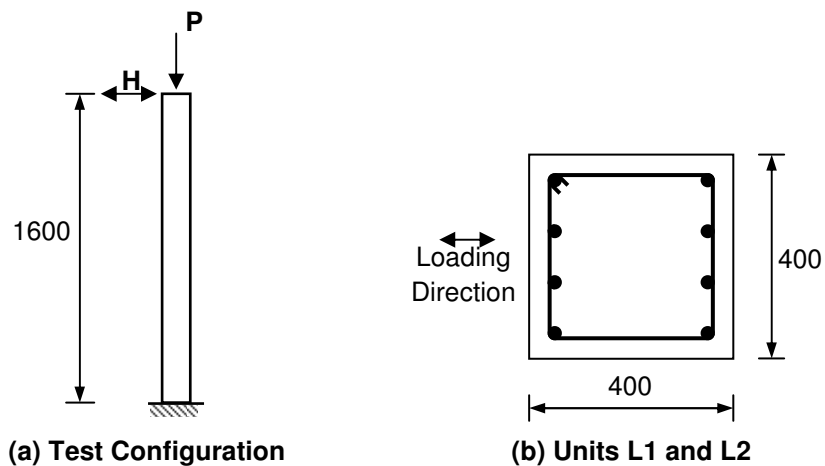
Specimen details of columns tested by Ohno and Nishioka (1984)
